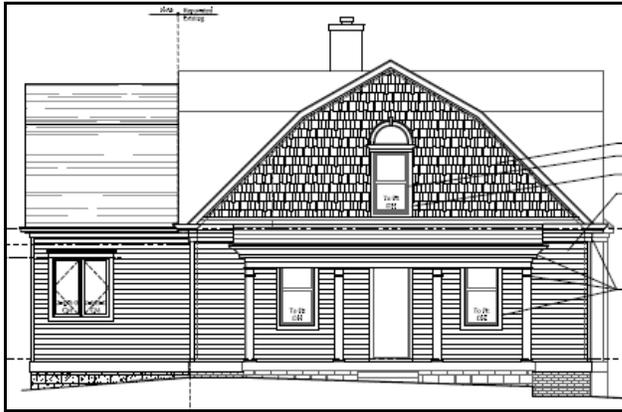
Front elevation with proposed wider portion of addition showing on the left.
